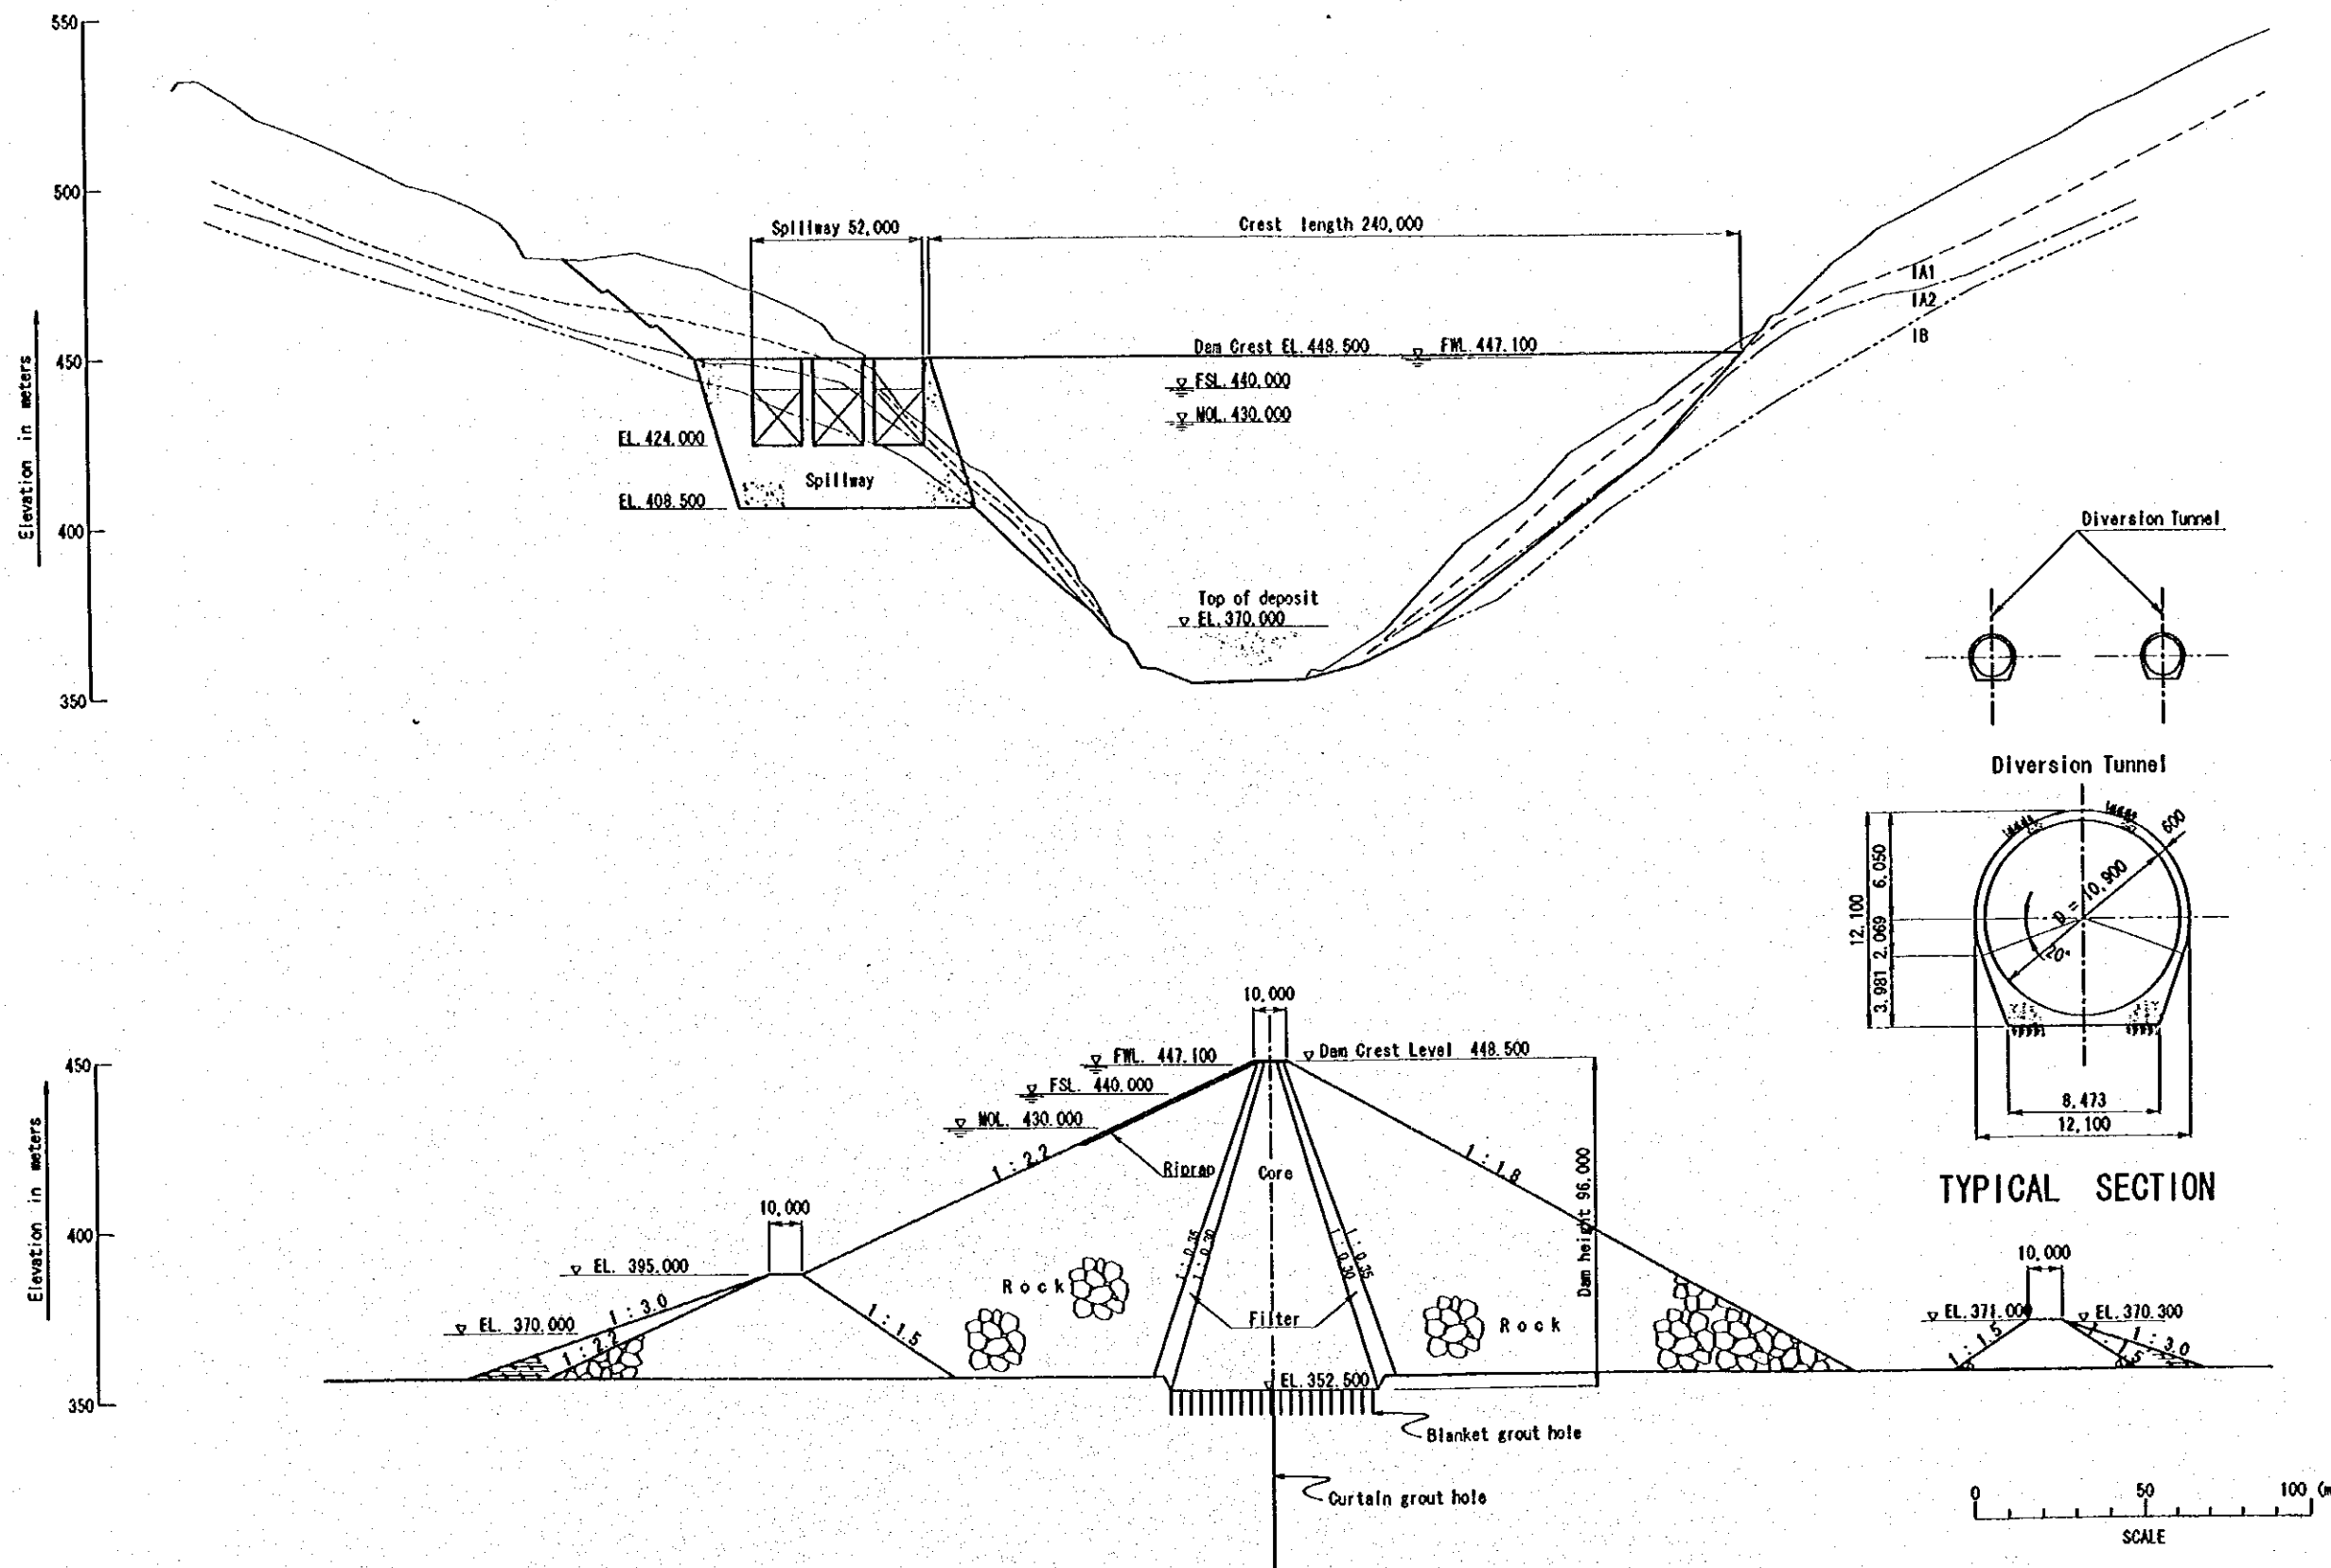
Typical Section and Profile of Dong Nai No.4 Dam
